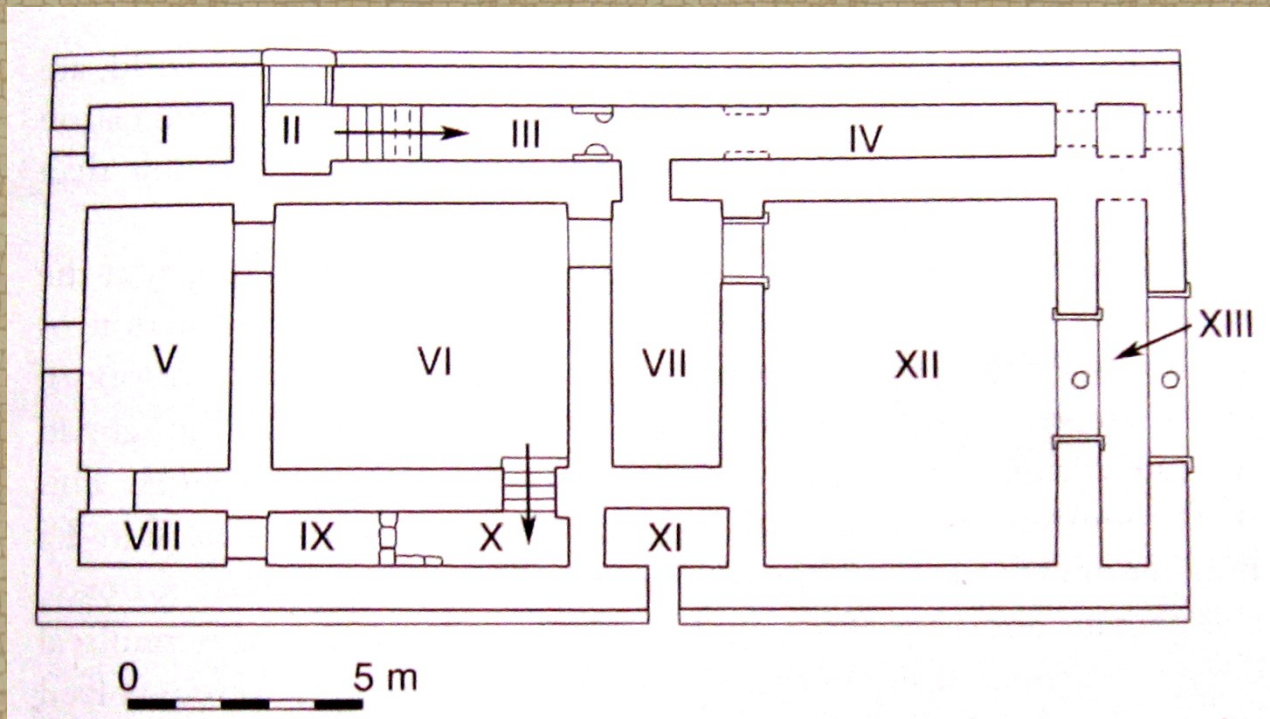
Reconstruction of the House of the Tiles at Lerna, EH IIB. M. H.
